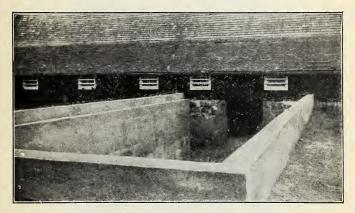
Concrete trench silo. (Courlesy of Canada Cement Co., Ltd.)
